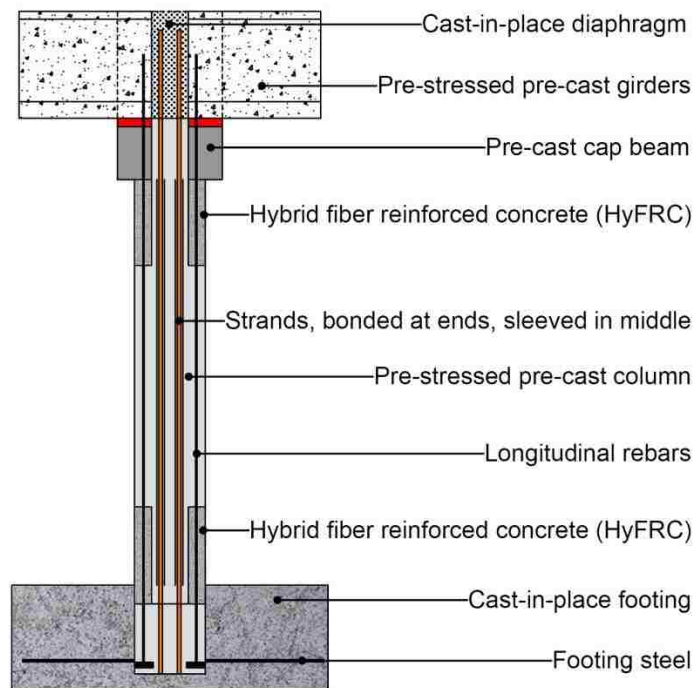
Elevation of prestressed concrete column system (adapted from Davis et al. (2011)).
